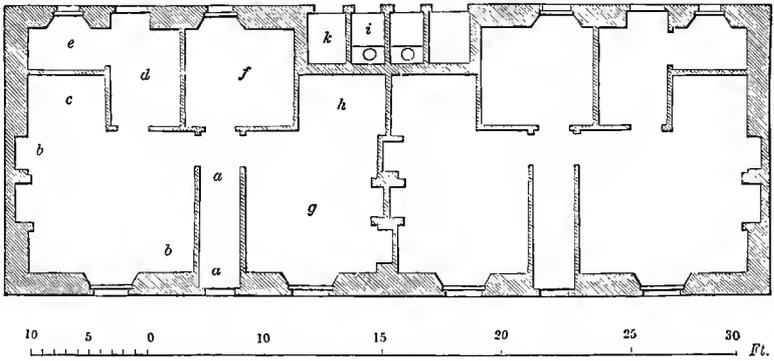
Alternative ground-plan to ground-plan in fig. 741.
